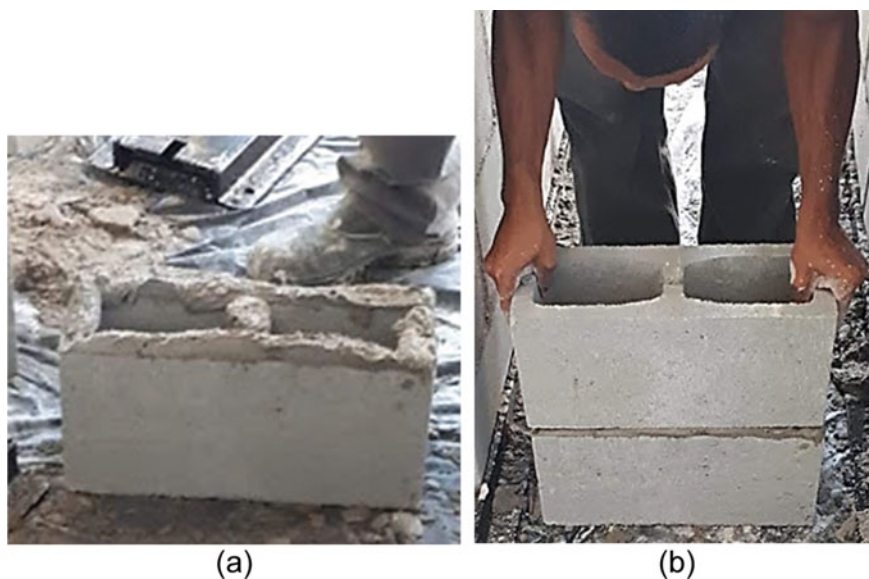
Construction of the prisms: a detail of the full bedding type b constructed prism. (Color figure online)
